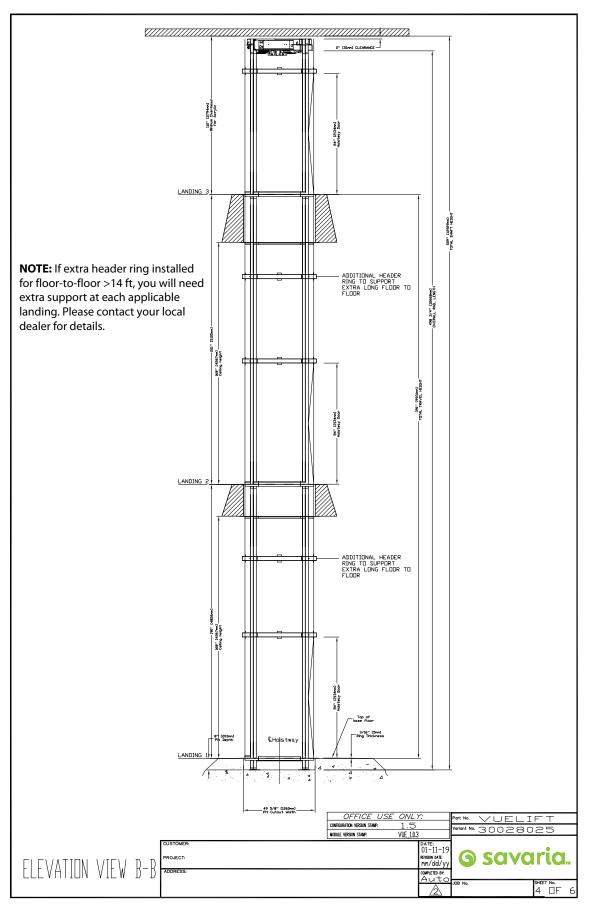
Elevation view - octagonal glass (OGM) type 1- extra header rings if floor-to-floor height > 14 ft
